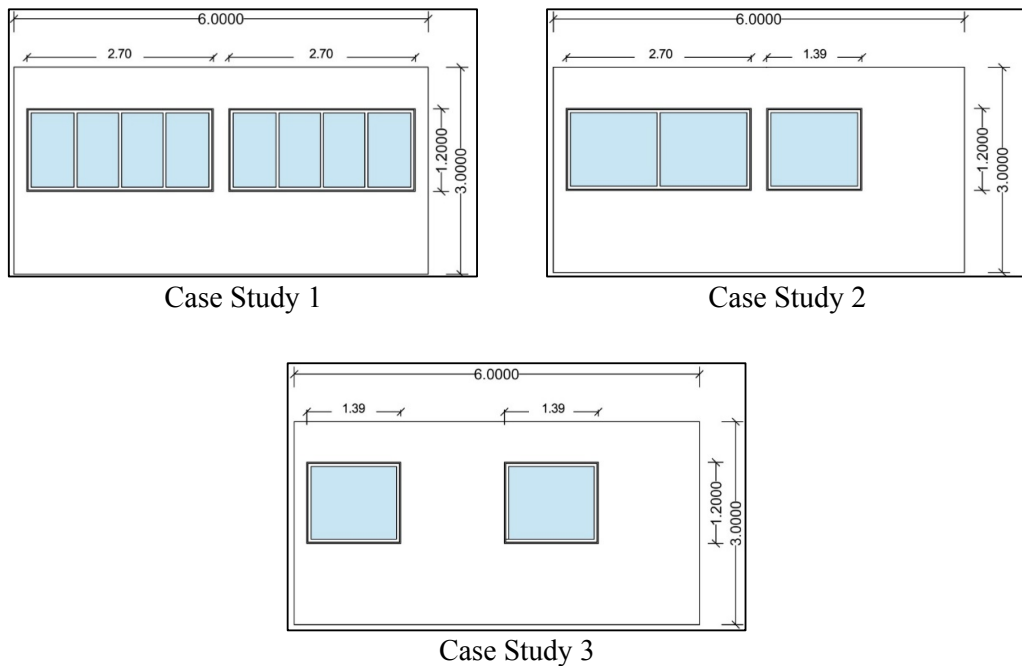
Apartment Façades in the Case Studies 1, 2 and 3
